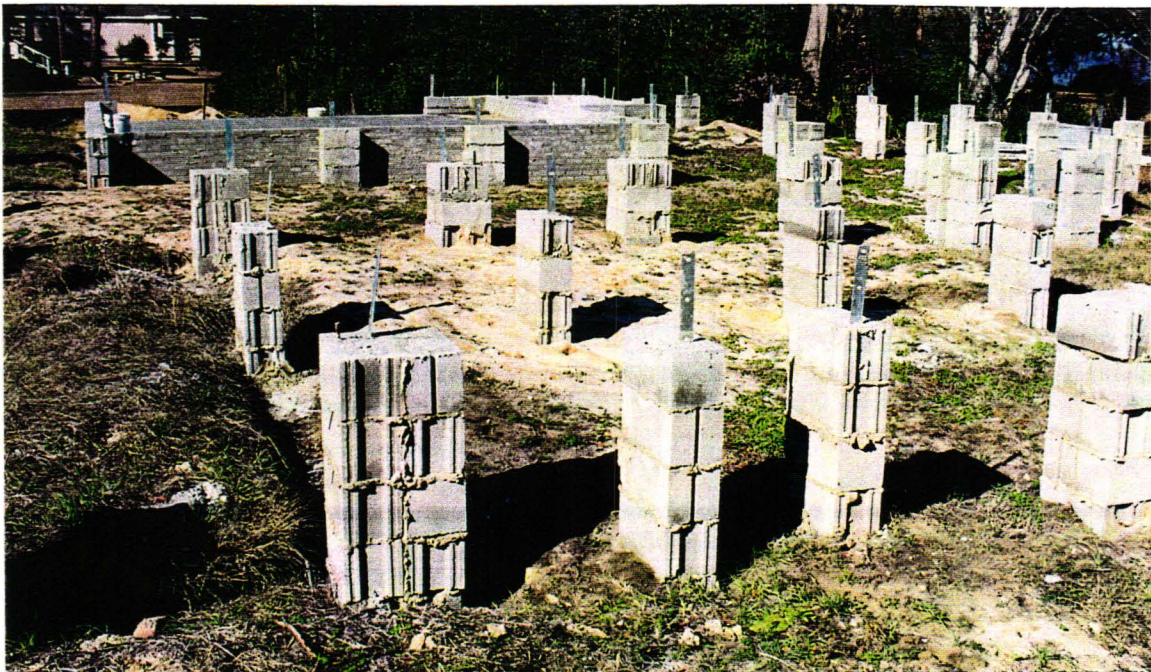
View of the foundations, piers, and slab from the eastern edge of Lot 1, looking to the northwest.
